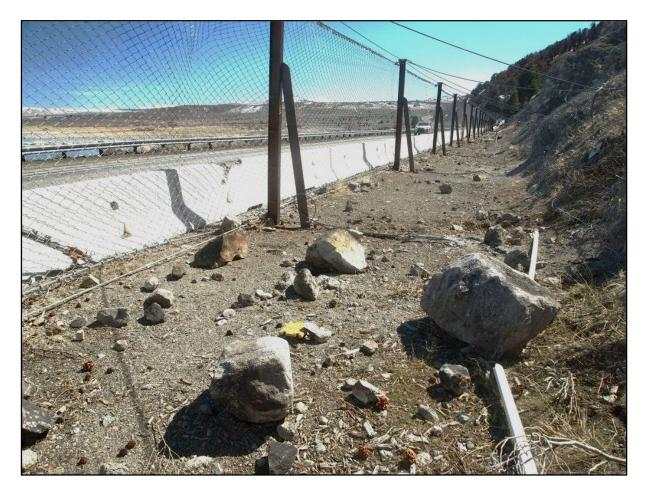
Rockfall event occurring on March 12, 2017 retained behind 3m Geobrugg GBE500AR flexible rockfall fence. (Photo credit: Joe Blommer, Caltrans)
